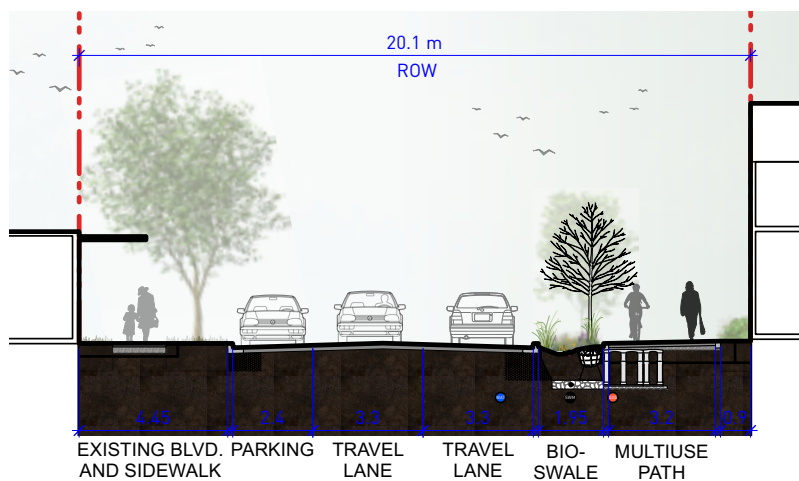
ENLARGEMENT 4 - TYPICAL STREETSCAPE
